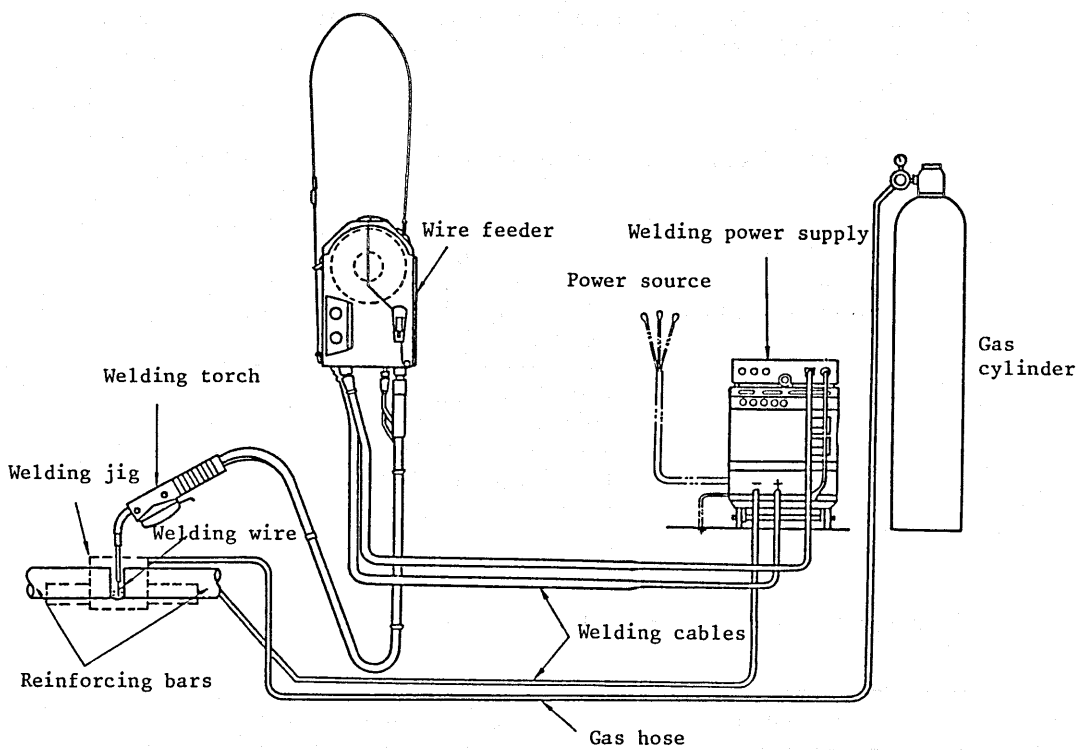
Example of semi-automatic enclosed arc welding equipment
